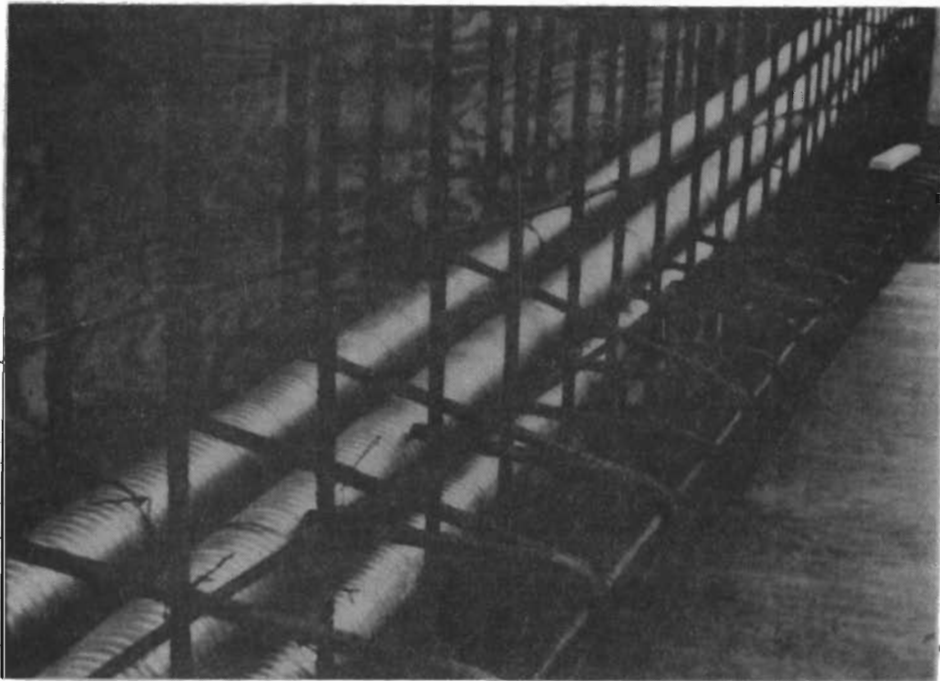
Location where stirrup bars had to be cut and then wired back in place to accommodate drape of web tendon ducts
